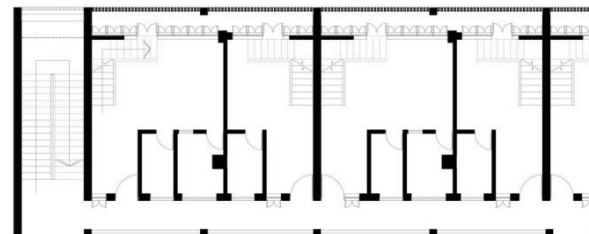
Enlarged Plan of Dwelling Units (First Floor) of Building No. 75
